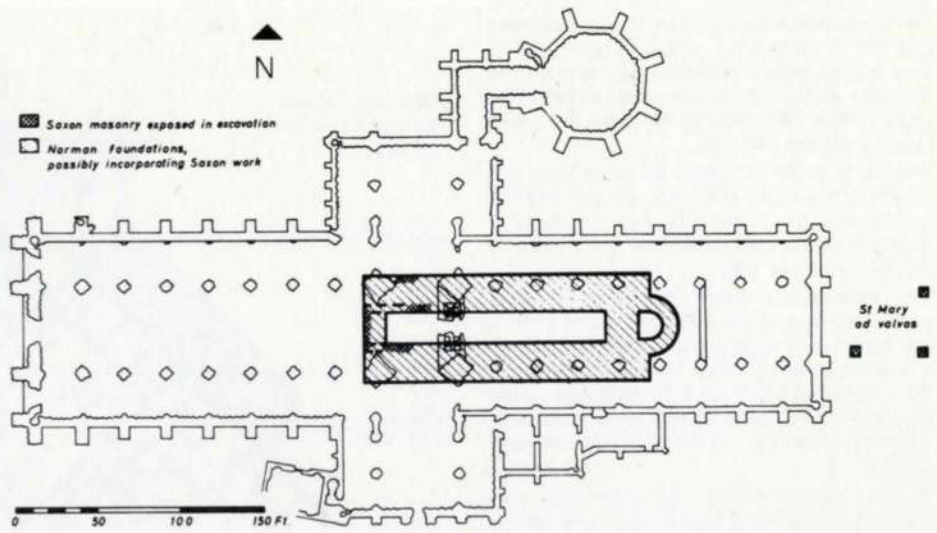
above. Plan of Norman foundations showing the areas of Saxon walling. Illustrator: Margaret Woodward.
